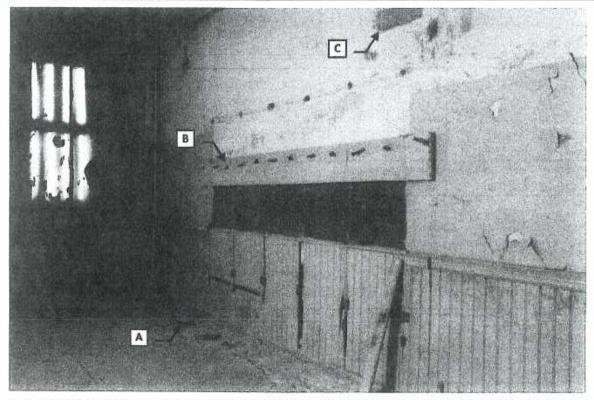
Girls' Bathroom view northwest. (A) Toilet flange connection, (B) Stall partition brackets, (C) Unknown ghost mark.
